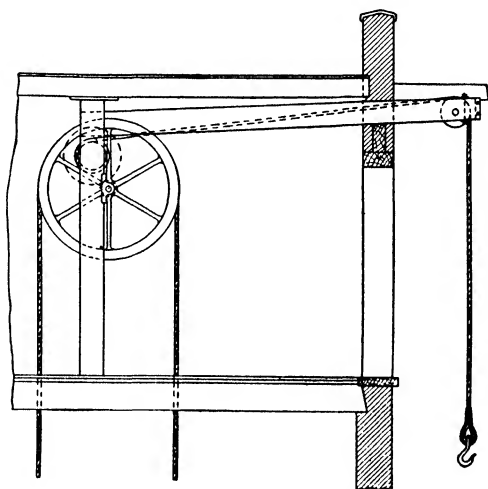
Details of Outrigger Arrangement for Sling Hand Elevator
